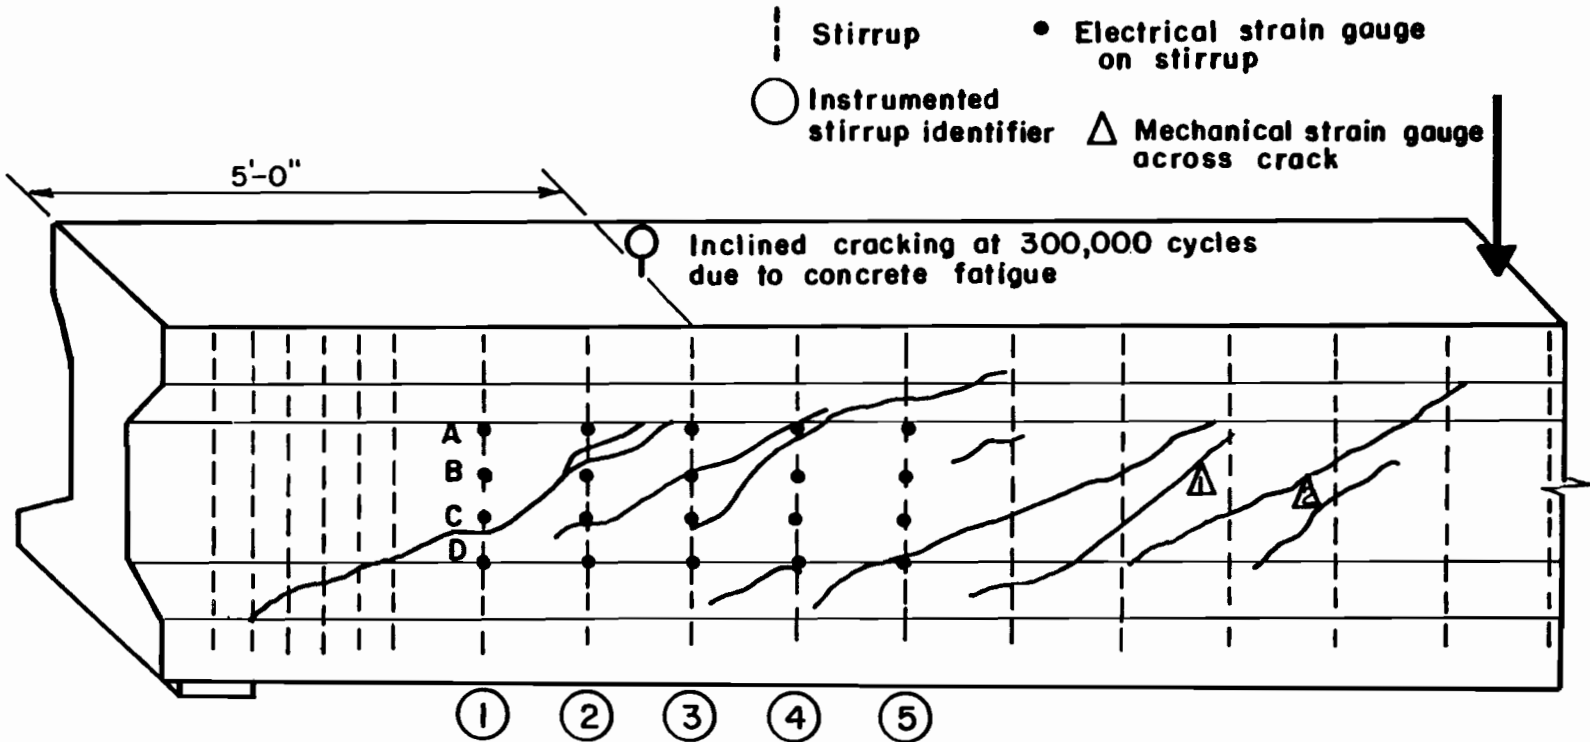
Beam 1, north shear span; instrumentation and crack pattern
